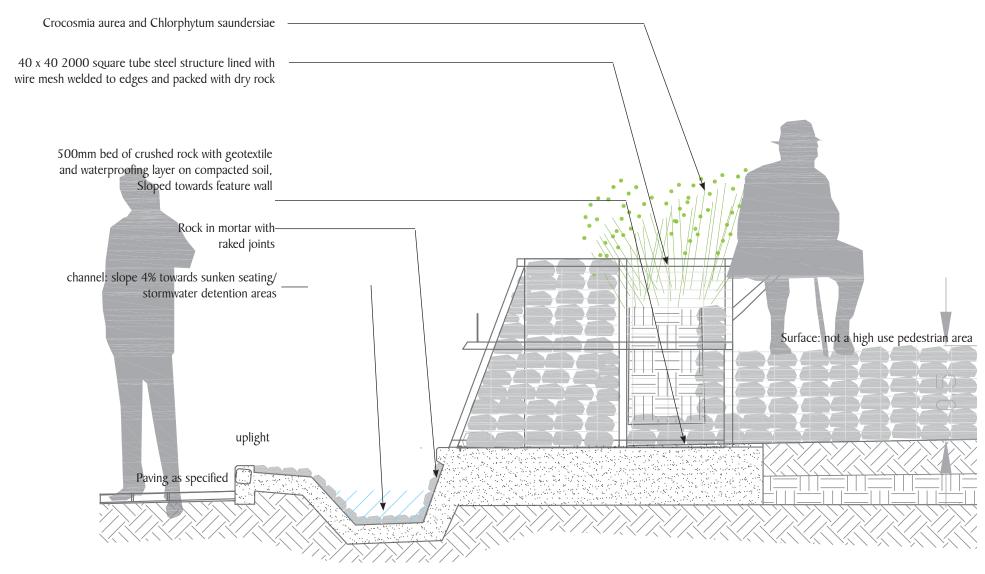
Section through stone packed wire-mesh and steel structure: feature wall (Author, 2008) Scale 1: 20
